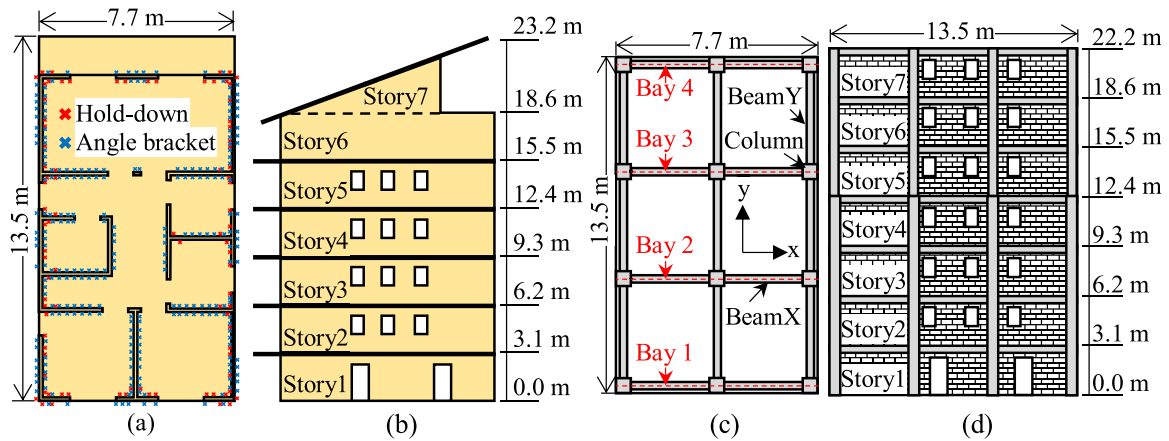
Plan and elevation views of the seven-story (a)–(b) CLT [85] and (c)–(d) RC buildings.
